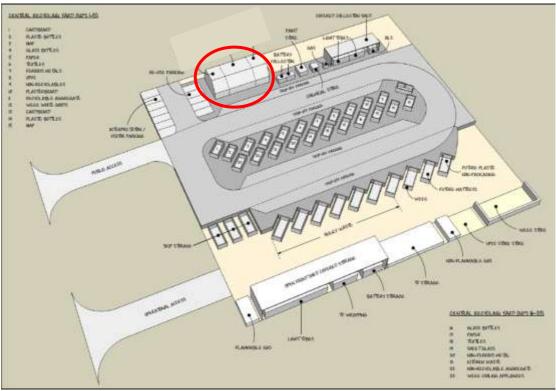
Layout for the Household Recycling Centre, La Collette
